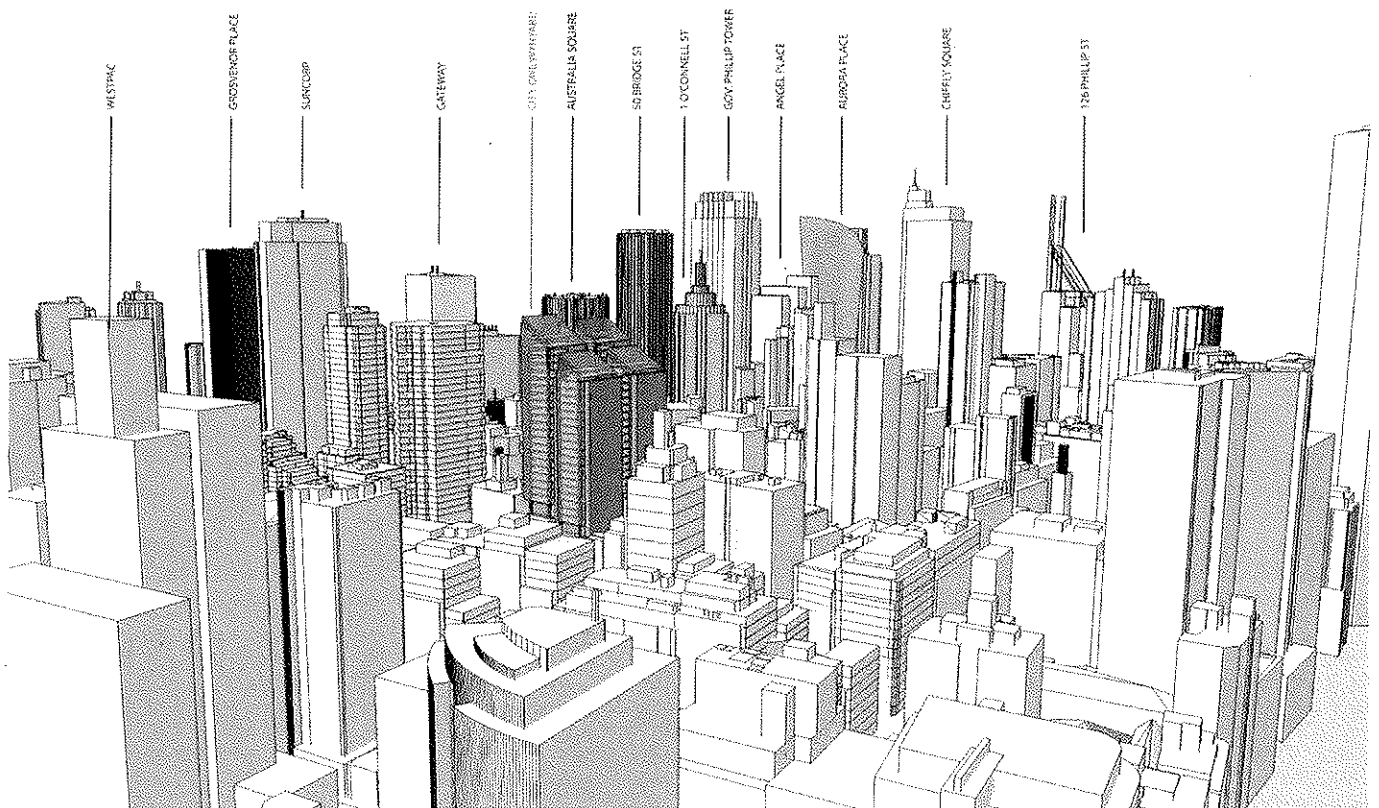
Perspective view of the proposed building in the city skyline context looking north-west
